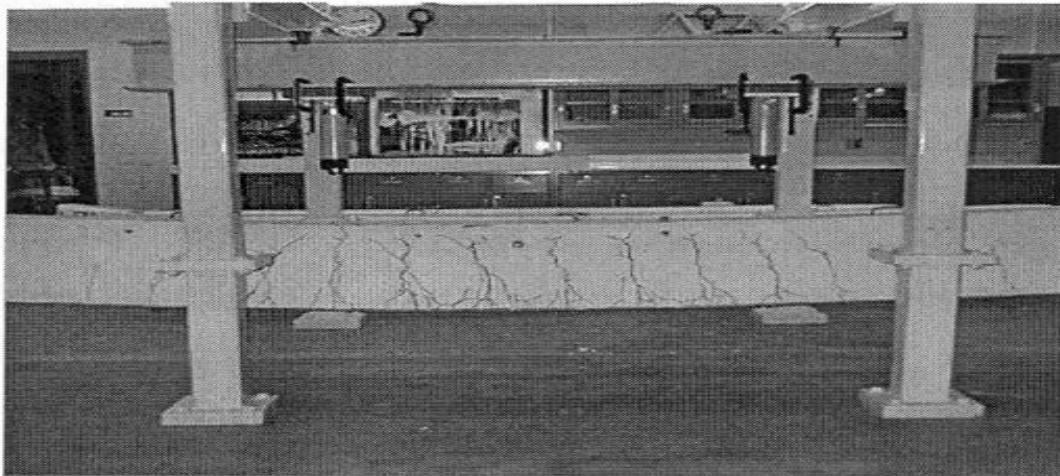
Beam failure in flexure (Buckhouse, 1997)
